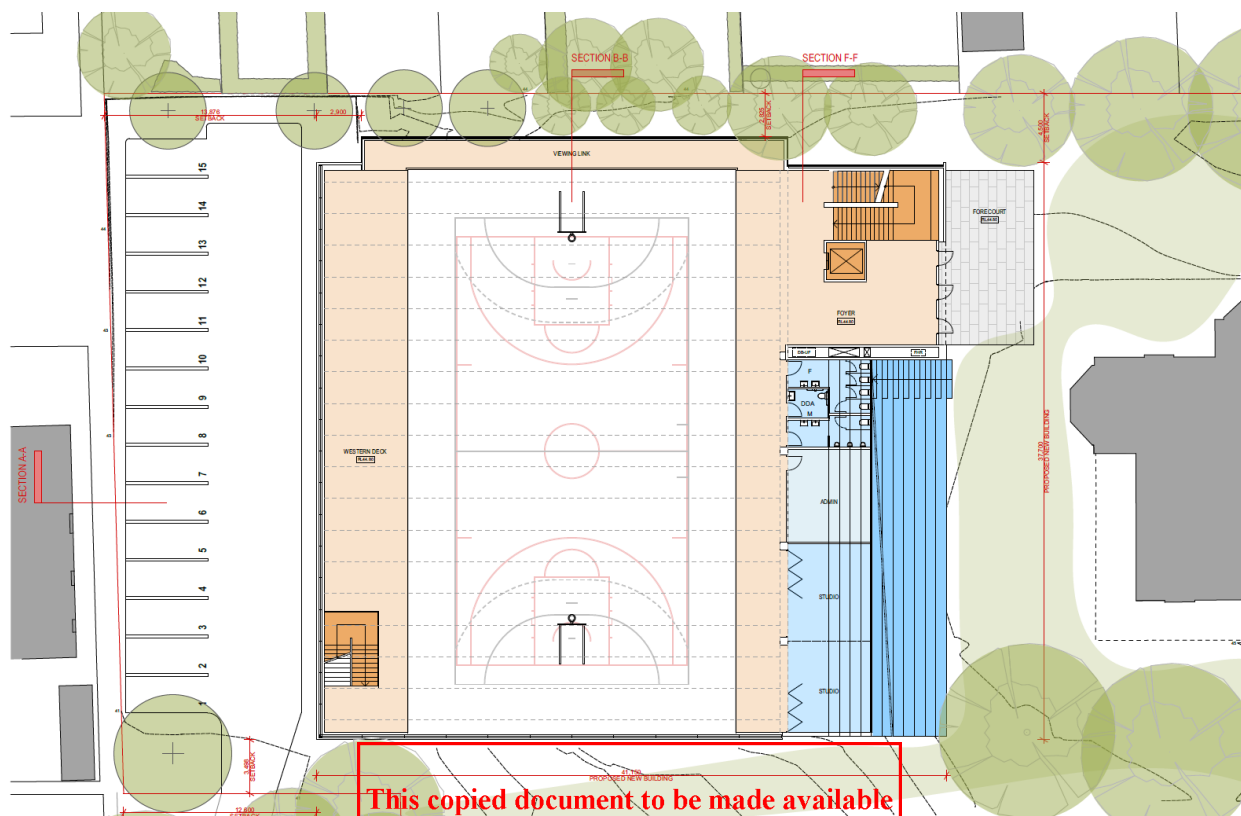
Excerpt from SD2.2. Proposed Upper Floor Plan. (Client, November 2021).
